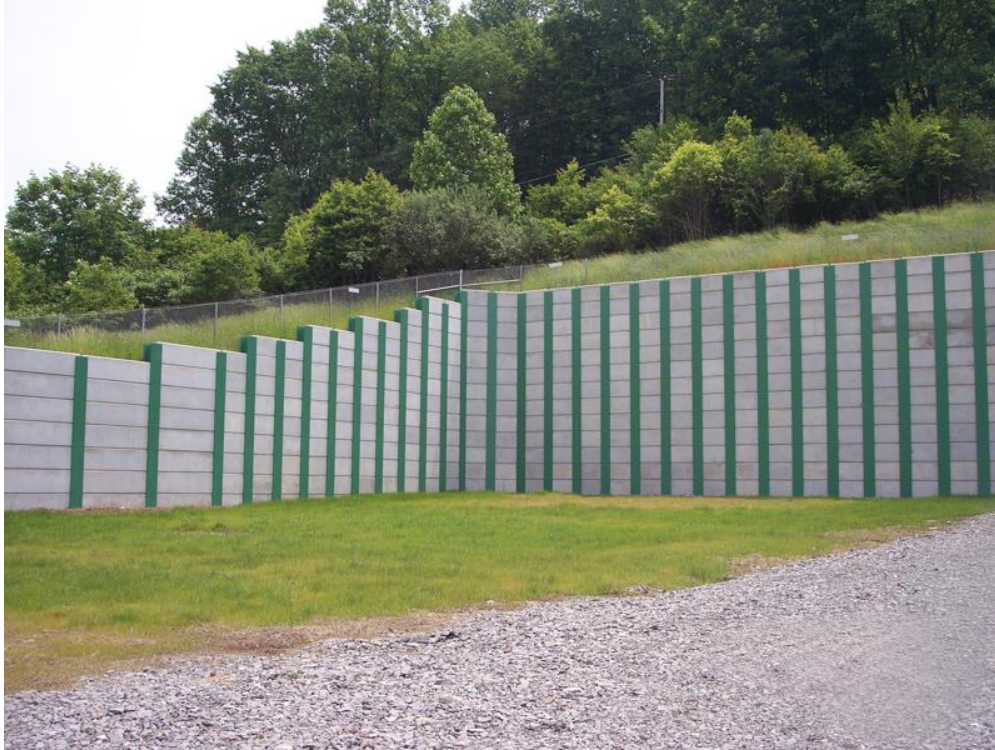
Example of a concrete lag wall (source: easternvault.net).
